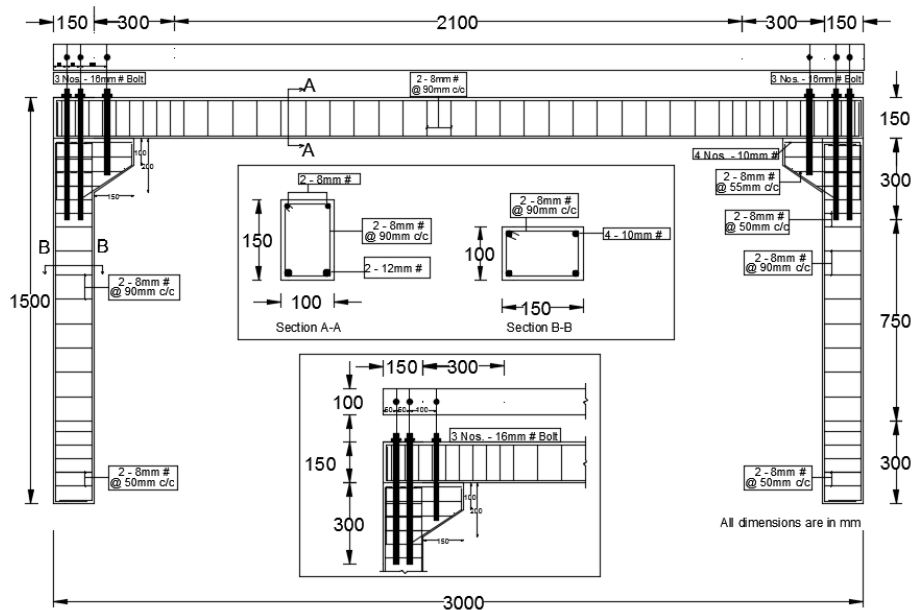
Reinforcement detailing of precast portal frame with corbel (PC-2)
